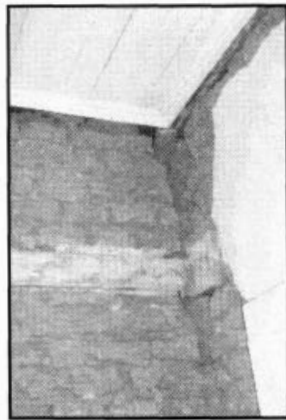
Sepulveda Adobe. Slippage of ceiling relative to supporting walls.
